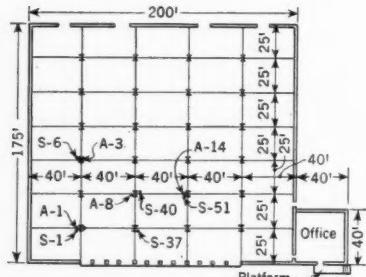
Floor plan of Schuhmacher Warehouse, Bryan, Tex., shows locations of anchor bolts (A) and slab corners (S) used as reference points in settlement study.
